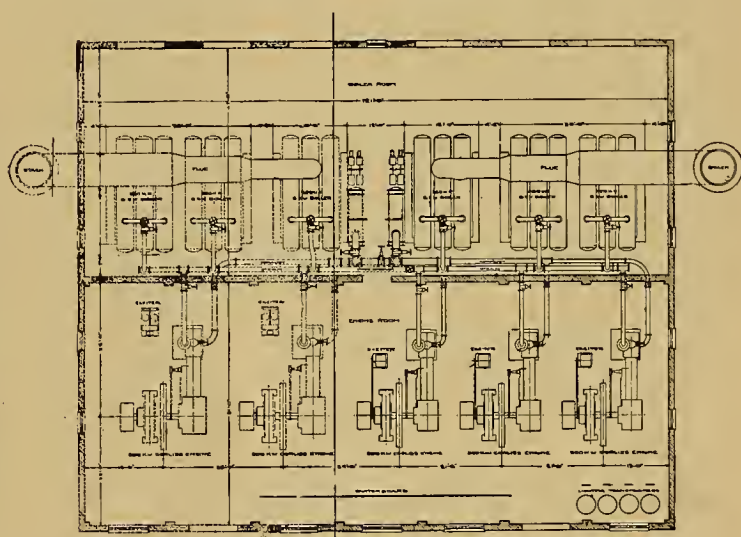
PLAN OF GENERAL ARRANGEMENT FOR SMALL STATION.
